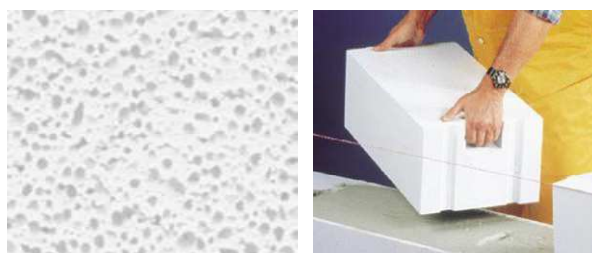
Autoclaved Aerated Concrete (AAC) blocks – Source: European autoclaved aerated concrete association
